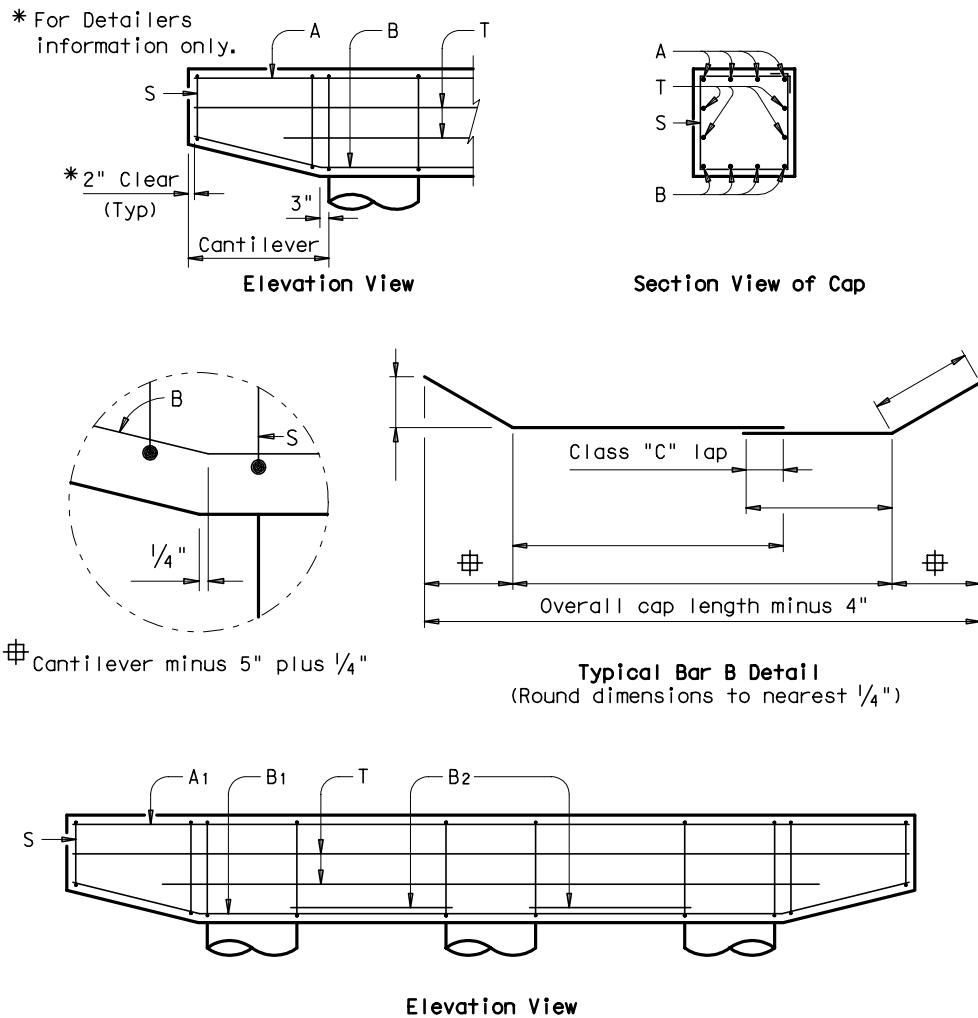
Bars B Details. Online users can click 4-17 to view this illustration in PDF.
